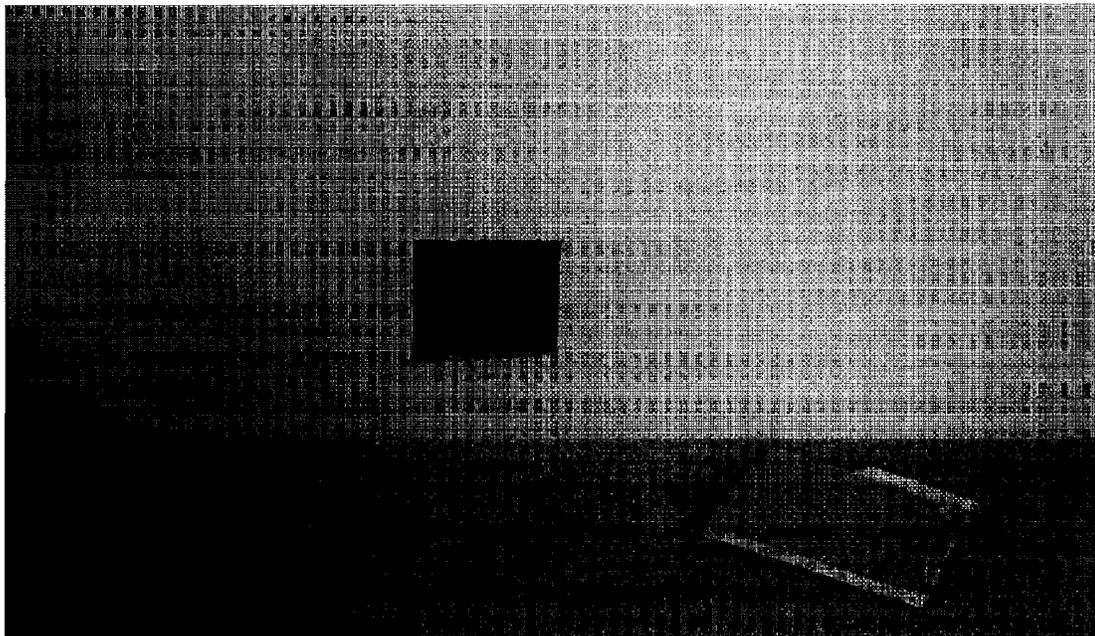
Photograph of an approximately 12 inch x 12 inch square cut into the drywall in the first floor guest bedroom.
